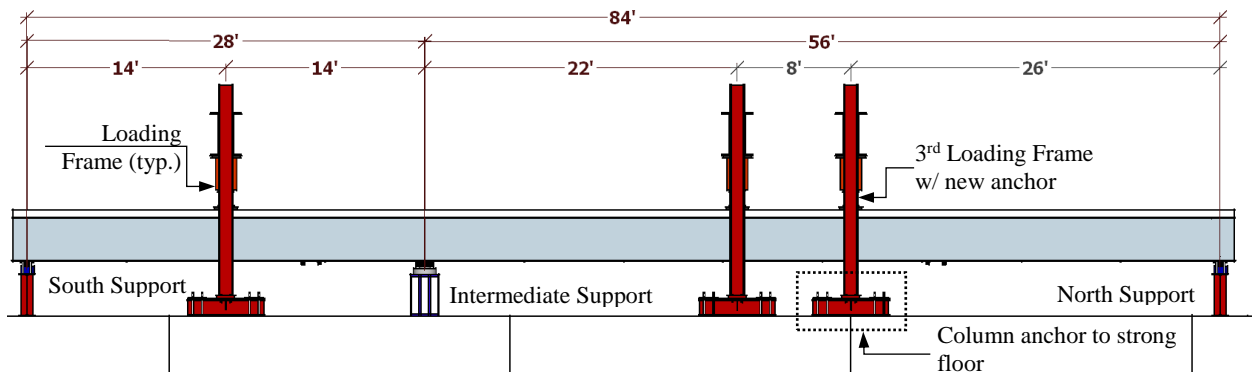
Continuous Girder Test Setup - Tub #3
